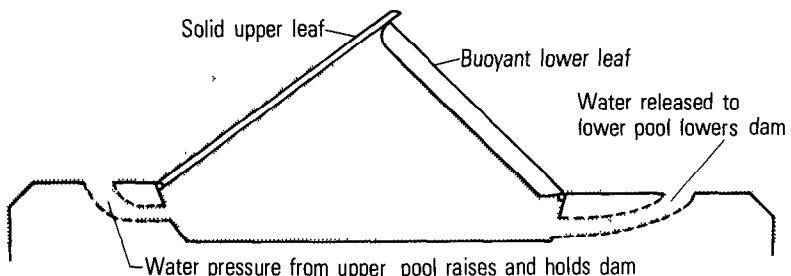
Bear-trap gate. (U.S. Army Corps of Engineers, 1952.)
